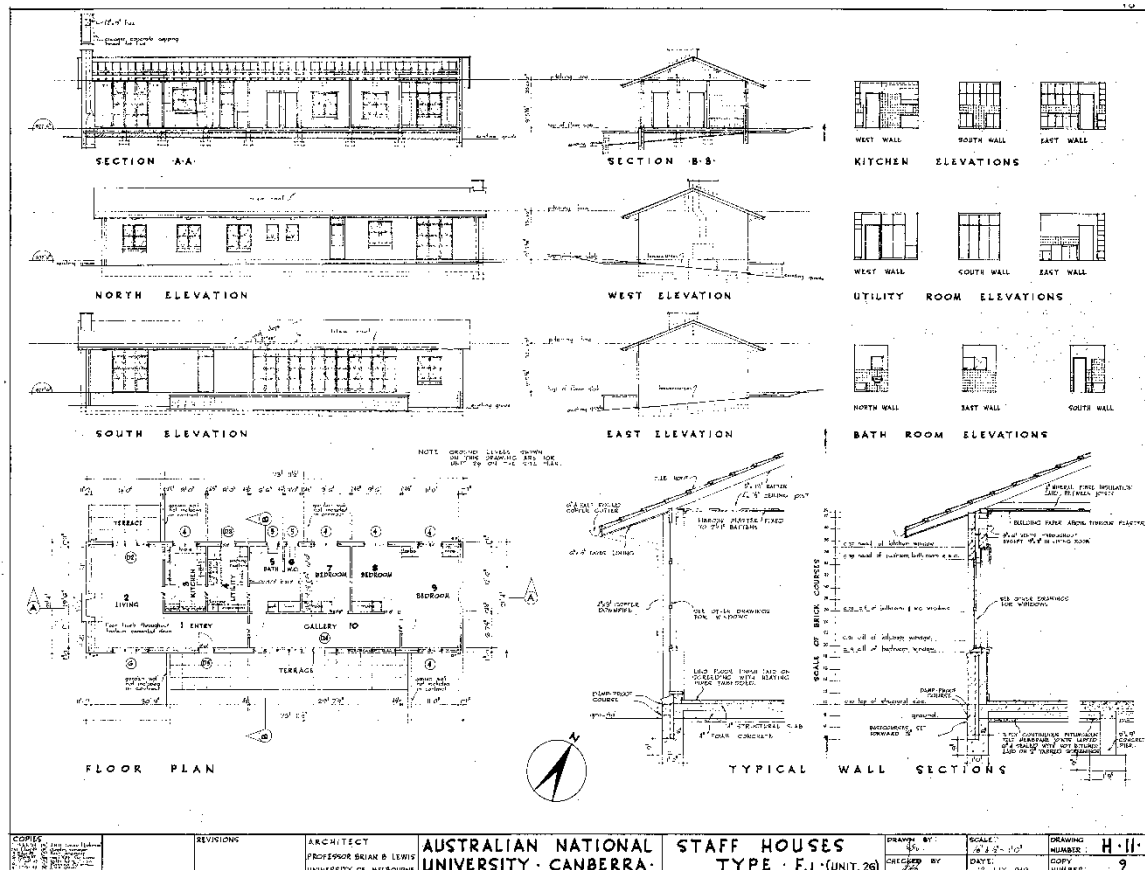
Plan and layout of the F Type staff housing created by Brian Lewis in July 1949. Five such houses were constructed.
